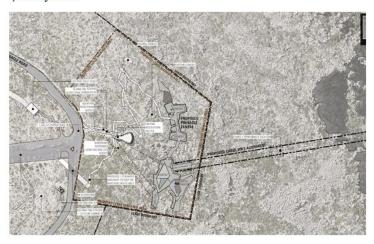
Extract: 1782_DA101 SITE PLAN & DRAWING SHEDULE
